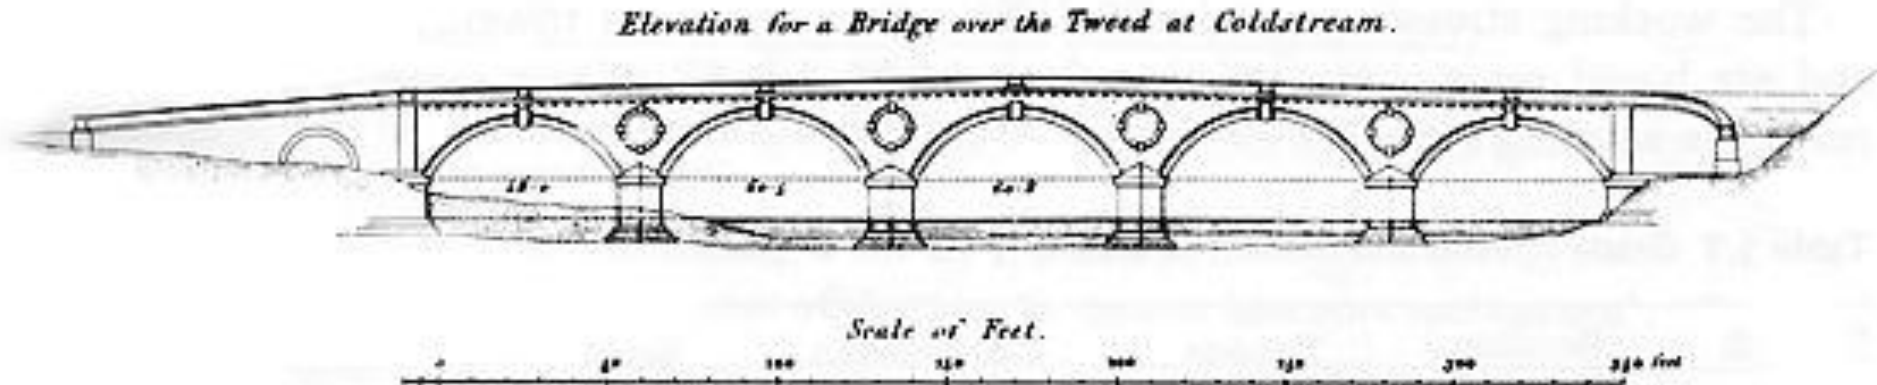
Elevation of masonry Bridge over the Tweed at Coldstream, 1866 (Irwin and Sibbald, 1983)
